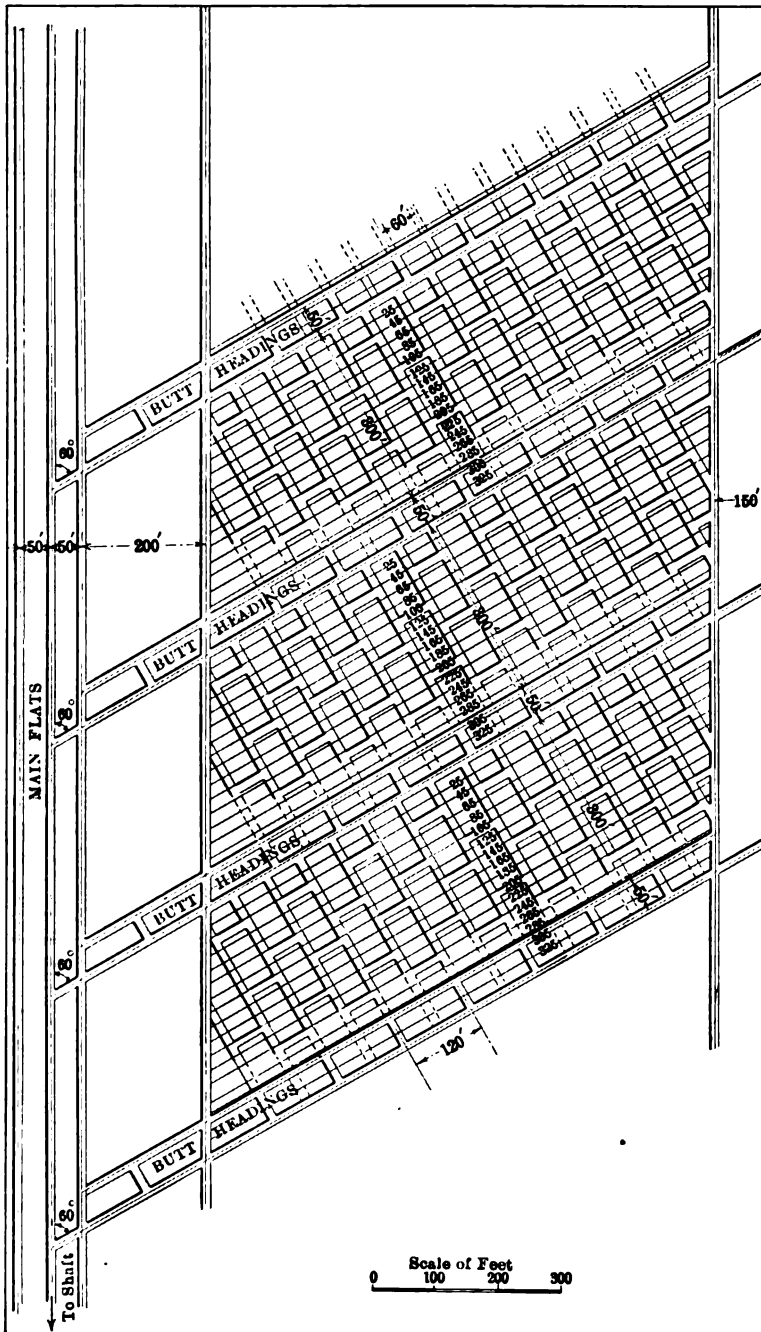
Plan of room and pillar development. (*Trans. A. I. M. E.*)
